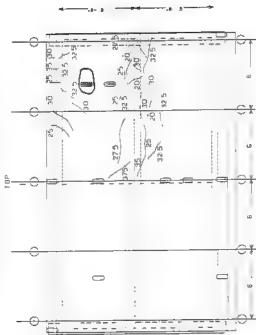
Top Cracking Pattern (First Bridge - Test No 5)
